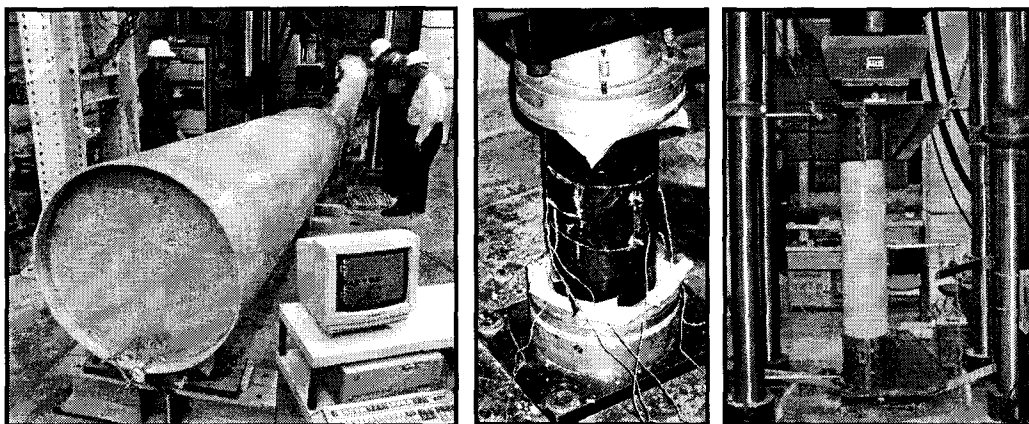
(a) shows a typical test set-up for beams tested in bending using stroke control and four-point load configuration. Table II provides the specific details of the beams. Beams 1 and 2 are similar in size but have two different laminate structure of the FRP tube. Beams 2, 3 and 4 have similar laminate structure but different diameter-to-thickness ratios, which provided reinforcement ratios of 7.4, 3.5 and 3.8 percent respectively. In this paper, the reinforcement ratio  $\rho$  is defined as the ratio of four times of the thickness  $t$  and the diameter  $D$ , ( $4t/D$ ).
